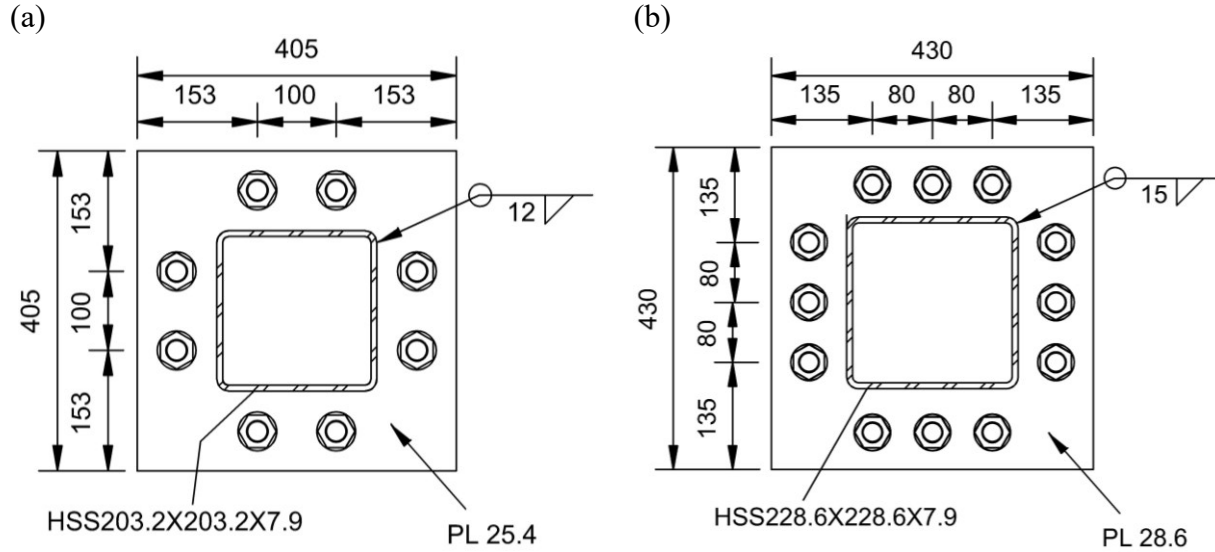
Brace splice connections: (a) Specimens 1 and 2; (b) Specimen 3 (dimensions in mm).
